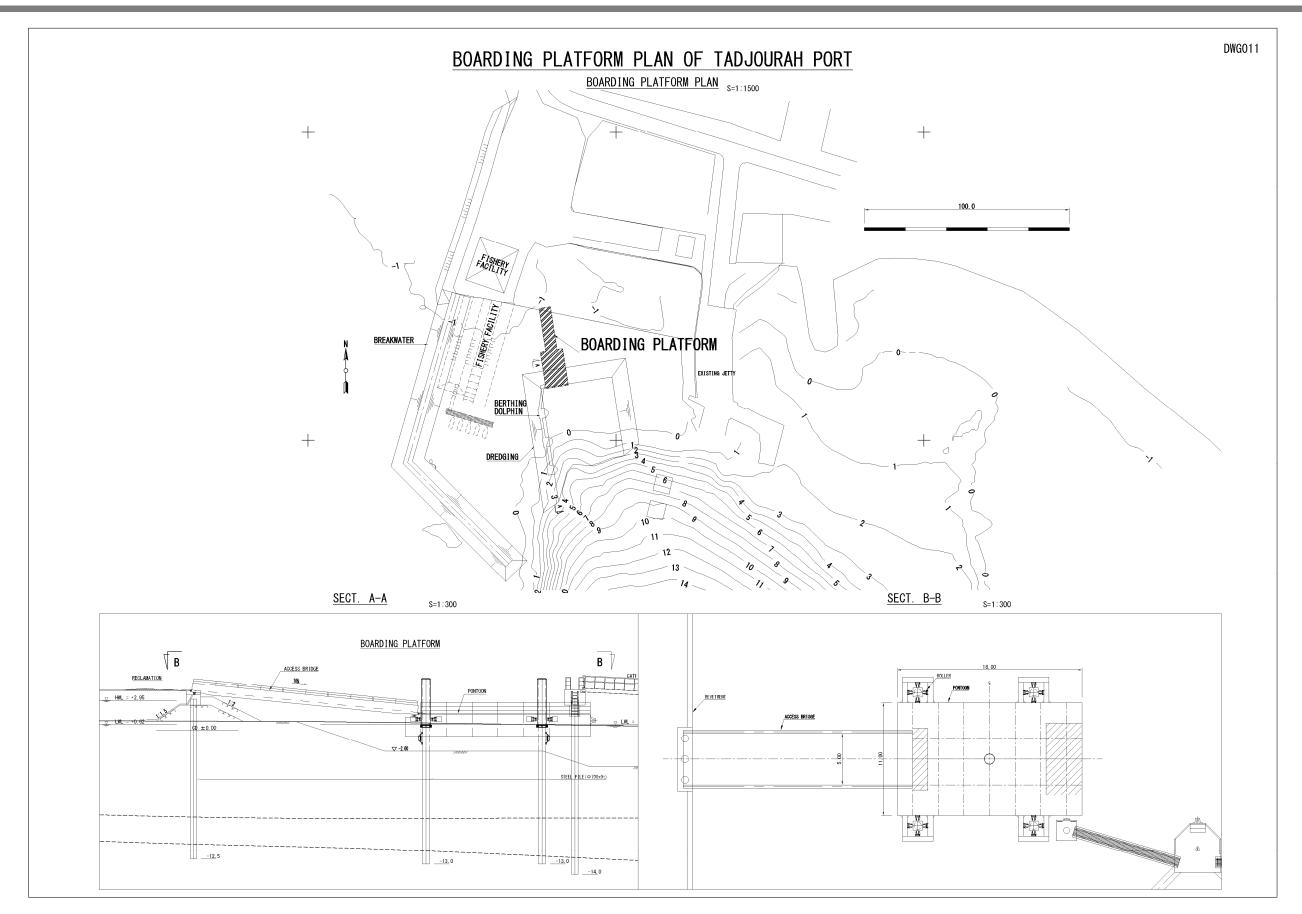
Boarding Platform Plan of Tadjourah Port
